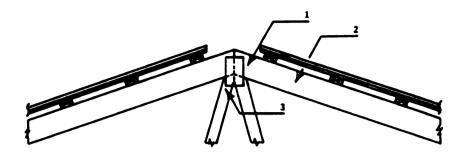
Location of test sites, Barn C. Truss No. 1, 15.4m (50'8") from east end. West elevation. Raised ridge cap not shown
